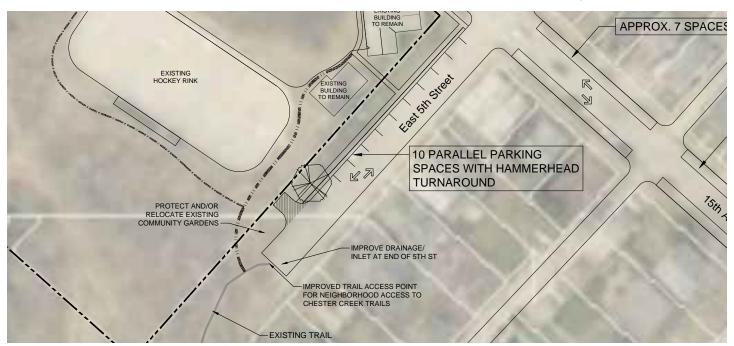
PHASE III E 5th STREET PARKING PLAN & TRAIL ACCESS IMPROVEMENTS
